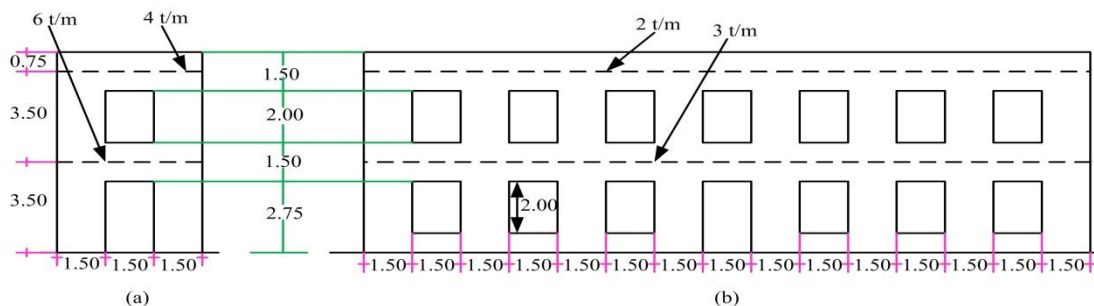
(a) One-bay and (b) seven-bay two-story masonry buildings (Akhveissy and Milani, 2013a)
